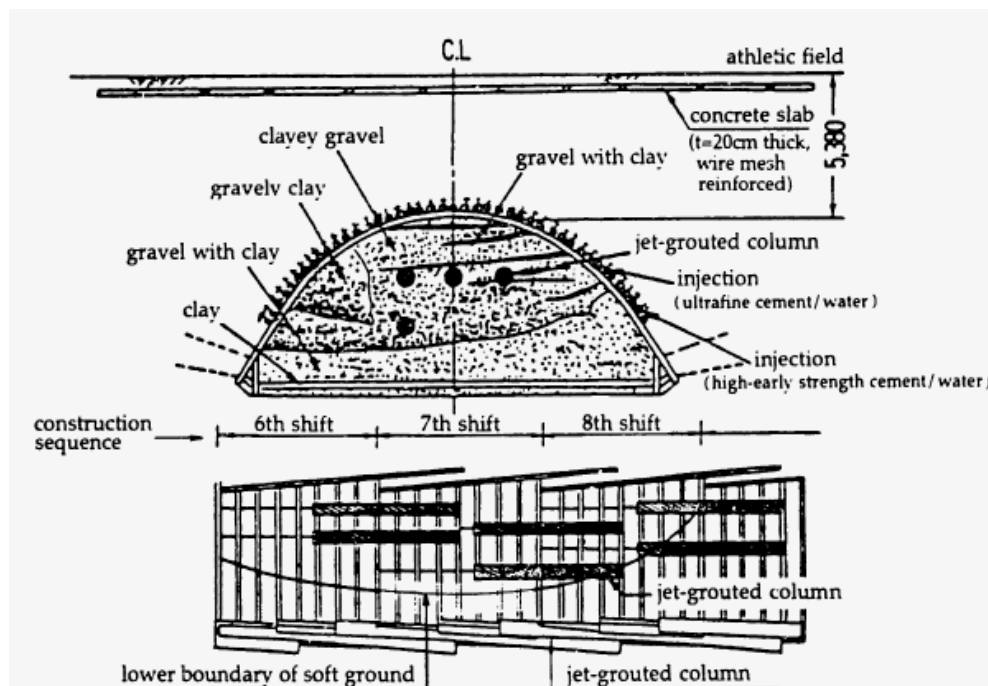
Type of soil generally encountered at the excavated tunnel under Fukuda Junior High School.
